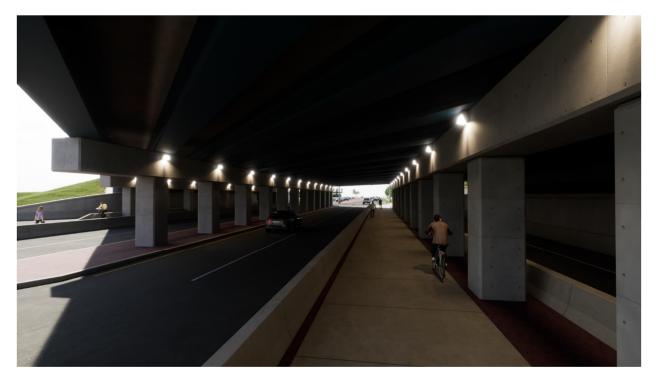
Rendering view of shared use path under the I-35 bridge on the north side of Armour Road (looking west)
